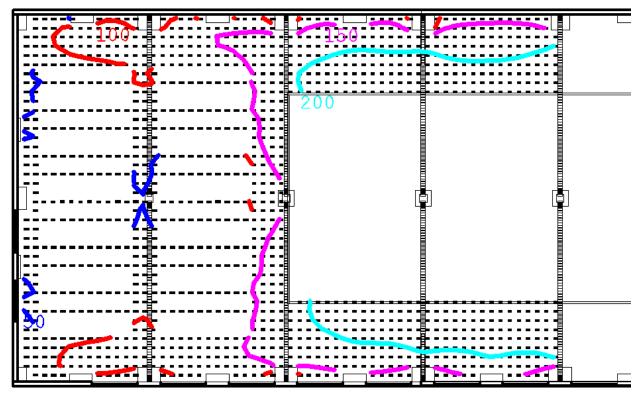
Library 3rd Floor West Isoline Calculation (Symetrical)
